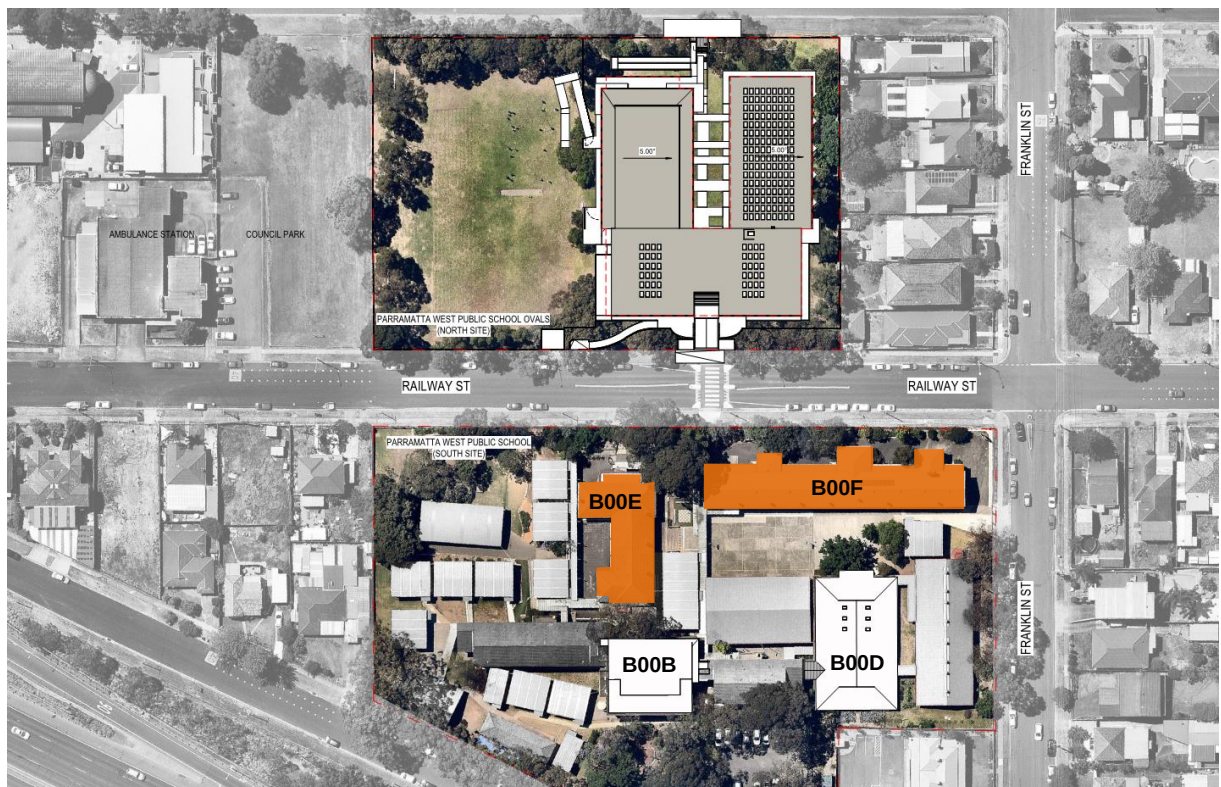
Proposed site plan with new school building on the northern playground. Heritage buildings of the school on south side are highlighted and labelled. (Source: Conrad Gargett)
